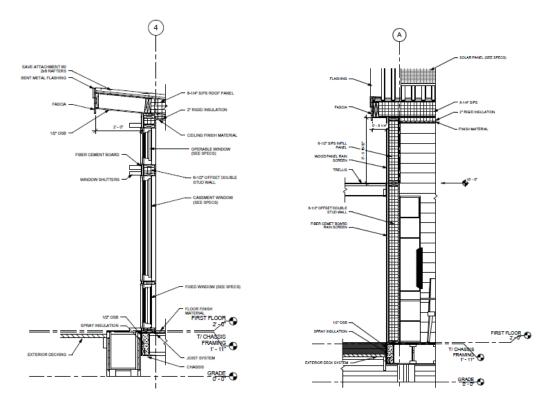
Wall construction sections generated from the Revit Architecture model.
